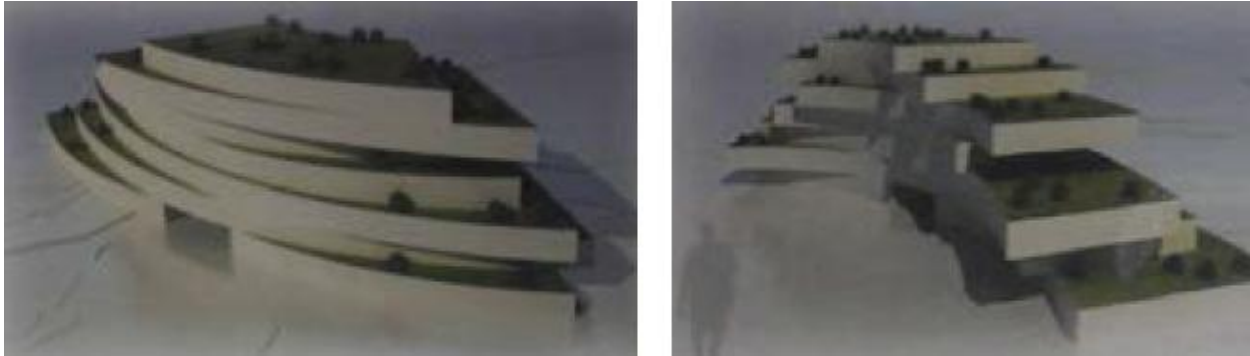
۱۳۰۰۰ Square meters ۱۰ story steel structure in Isfahan. TADAS dampers are used in this project
